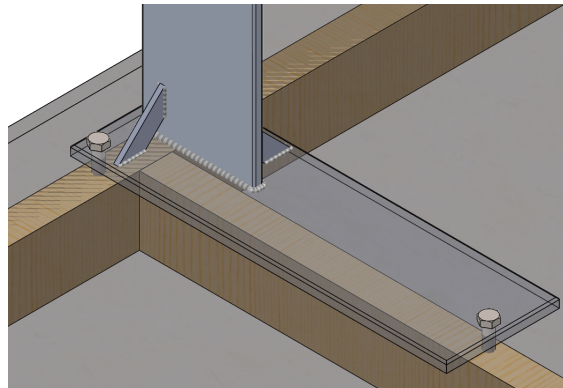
The vertical support plate is welded to the base support plate, which in turn is bolted in to the base beams through 10 mm wooden screws.
